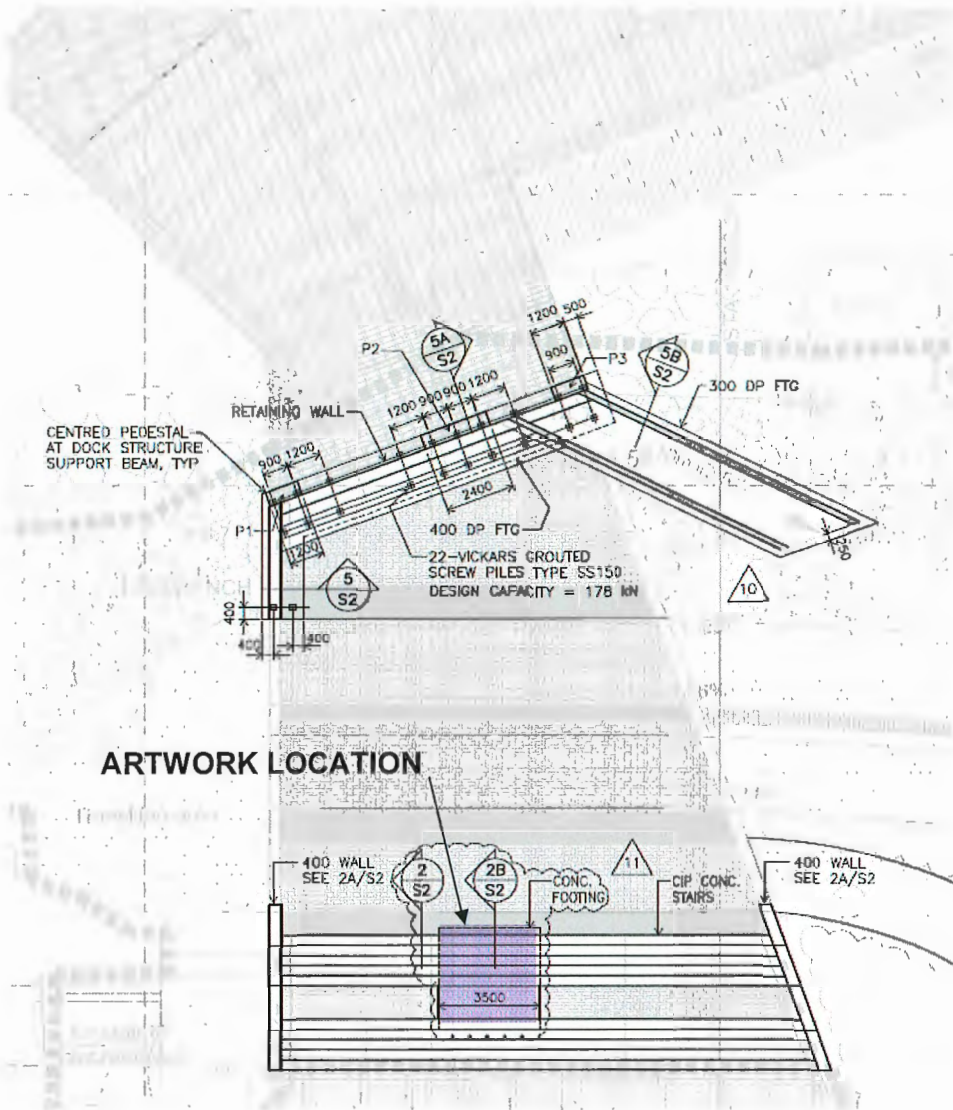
Waterfront Park partial Plan – concrete pedestal on upper stairs
